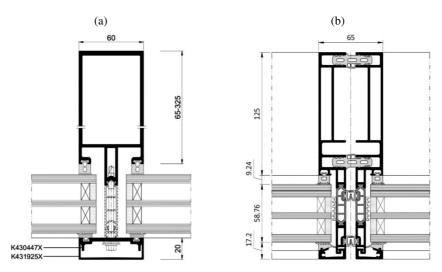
Cross-section of the mullion profiles: (a) stick façade system, (b) unitized façade system (drawings of the MB-SR60N and MB-SE65 façade systems, courtesy of Aluprof)
